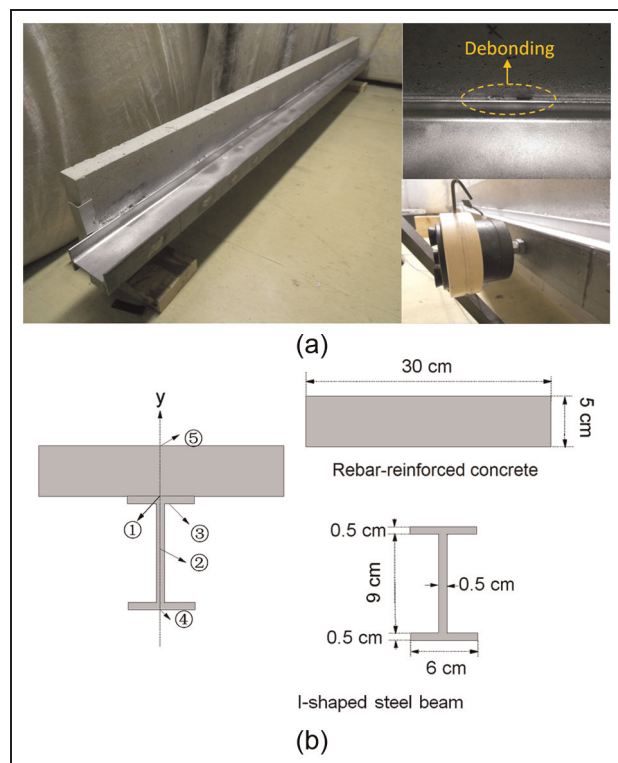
(a) A concrete slab reinforced with an I-shaped steel beam and (b) cross-section of the reinforced concrete slab.
